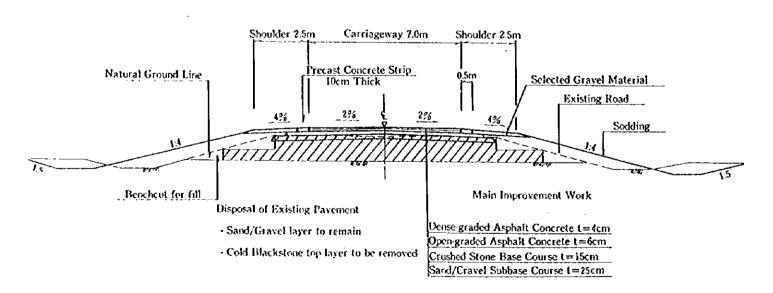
Cross-Section of Road for Type-II Improvement
